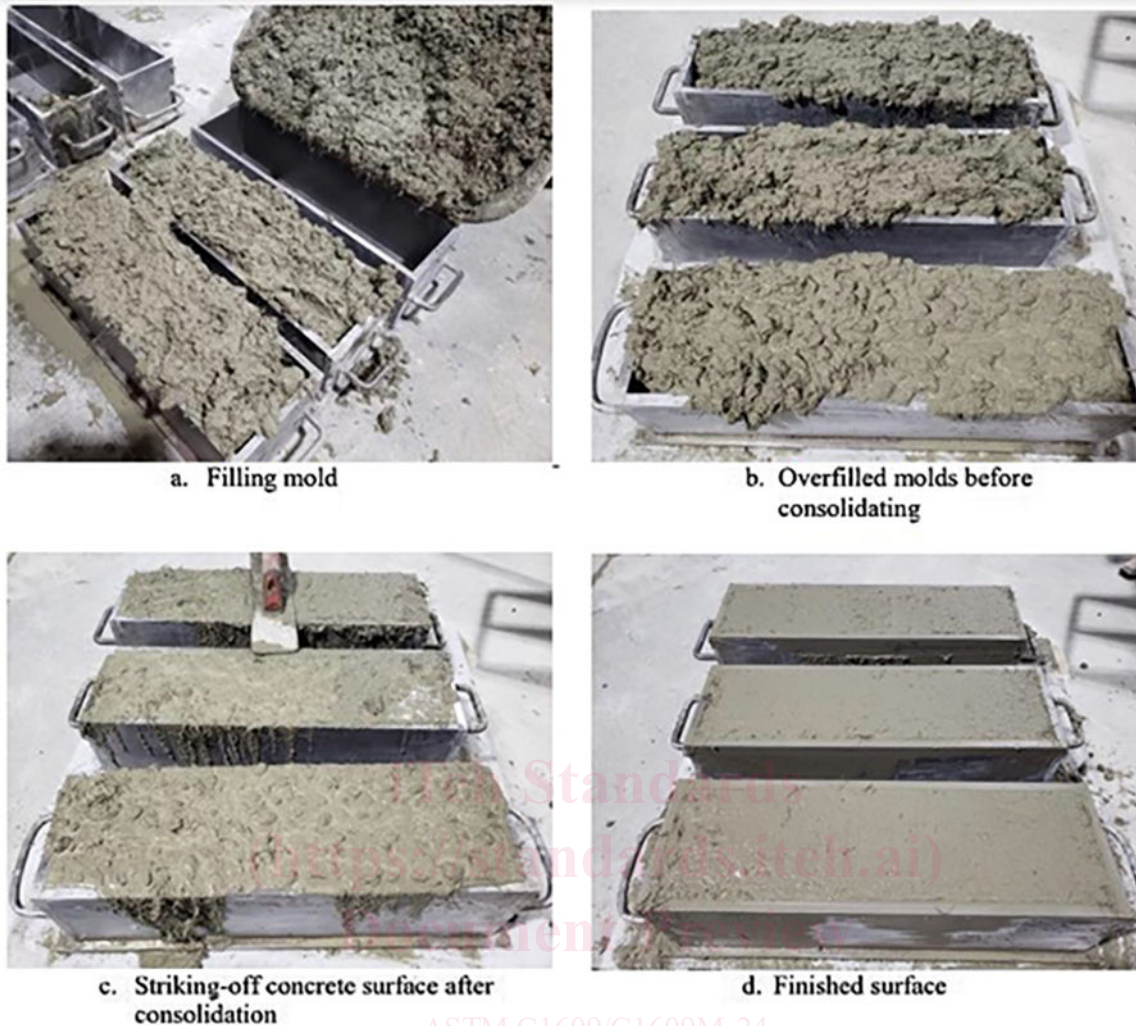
Making Fiber-Reinforced Concrete Test Specimens
